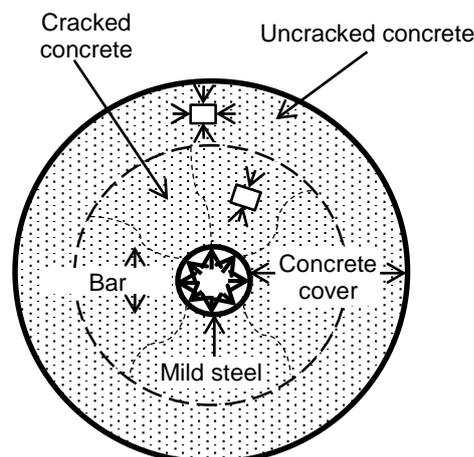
Transverse stresses around a pulled bar in the plan view of concrete cylinder [14].
